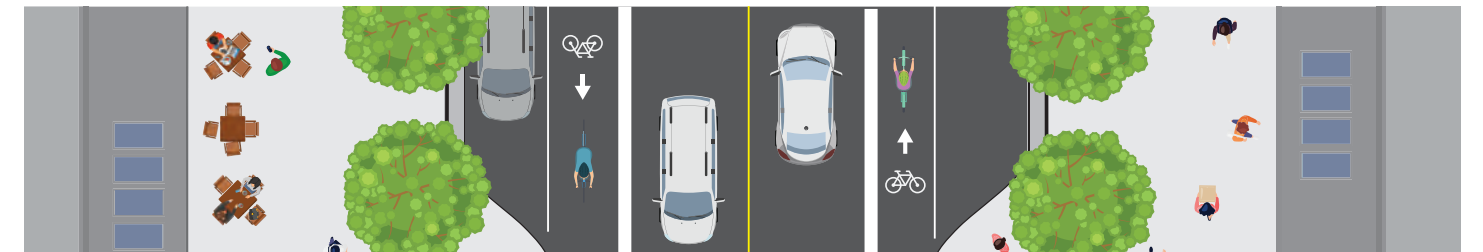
PROPOSED MAIN STREET CROSS SECTION
